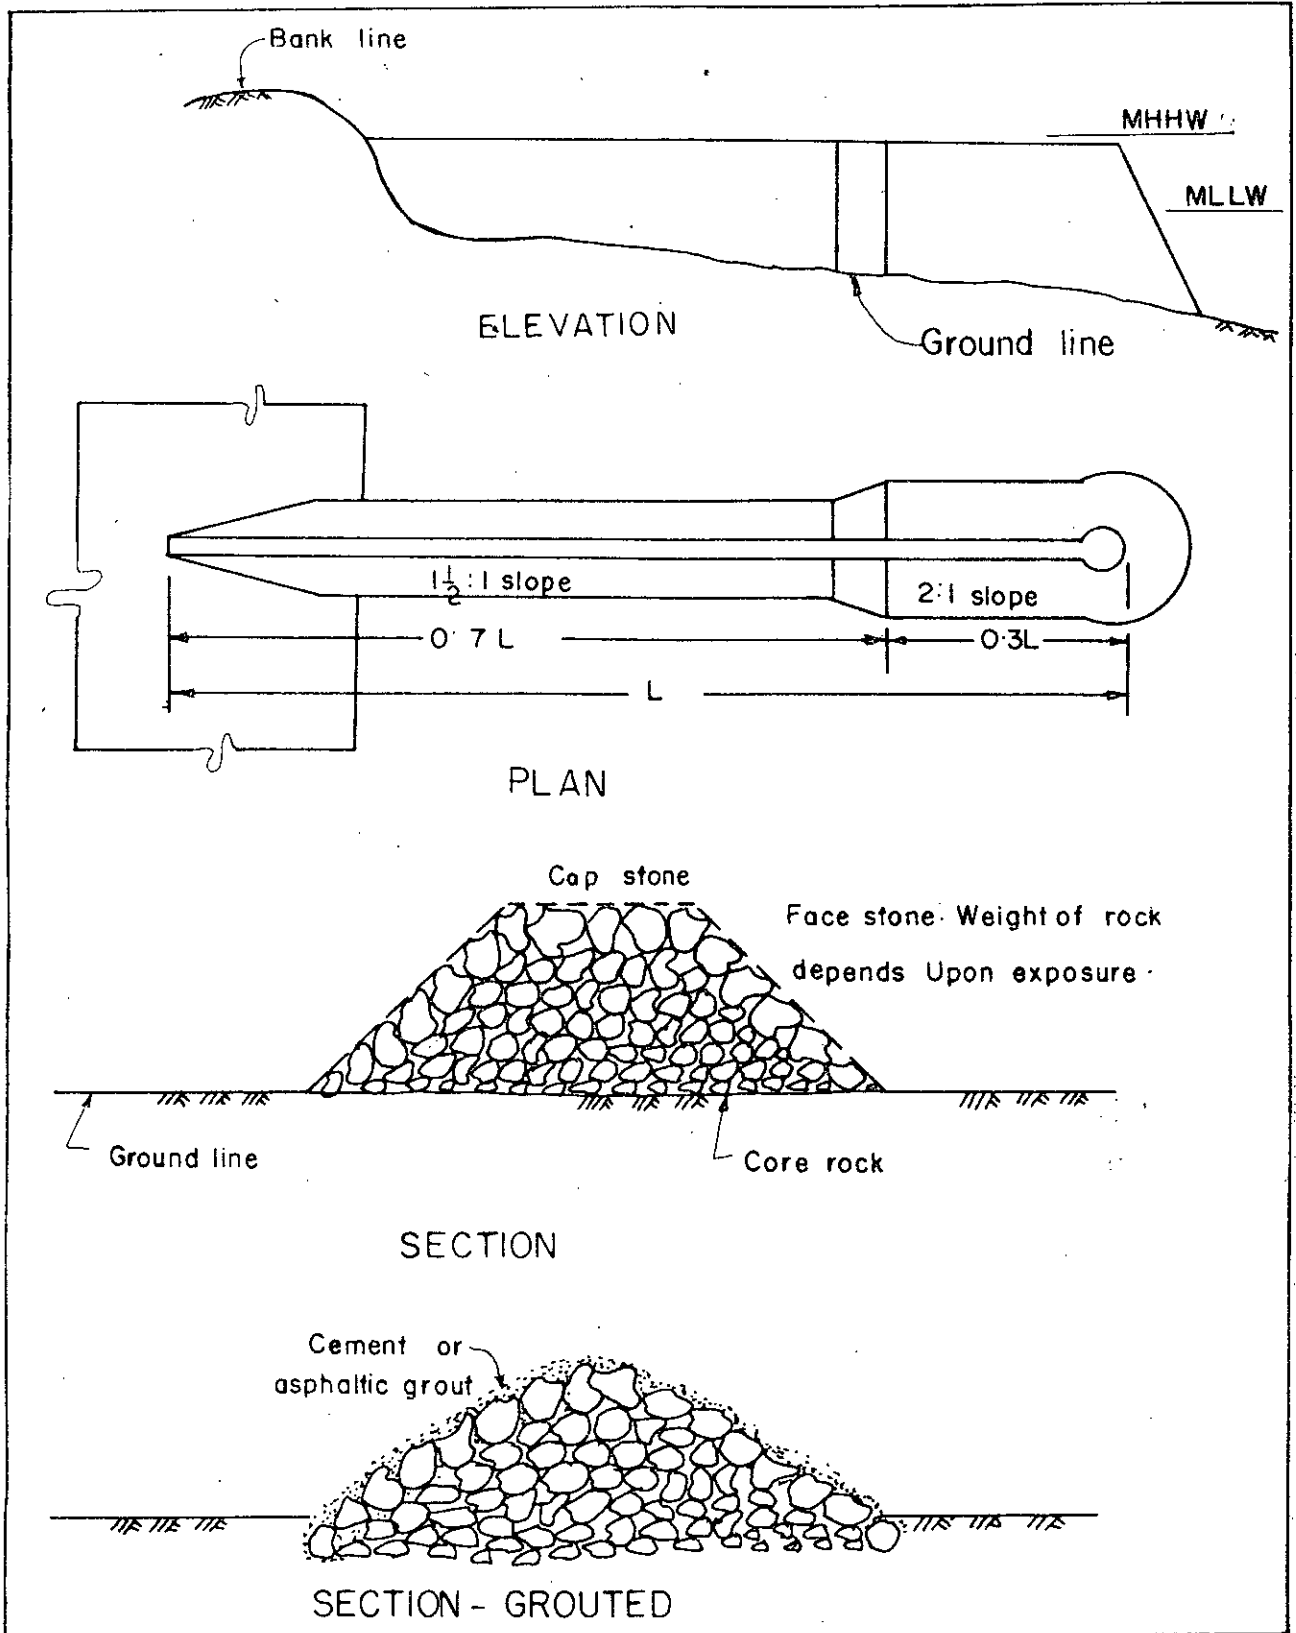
Typical stone dike groin details. (after California Highway Practice)
